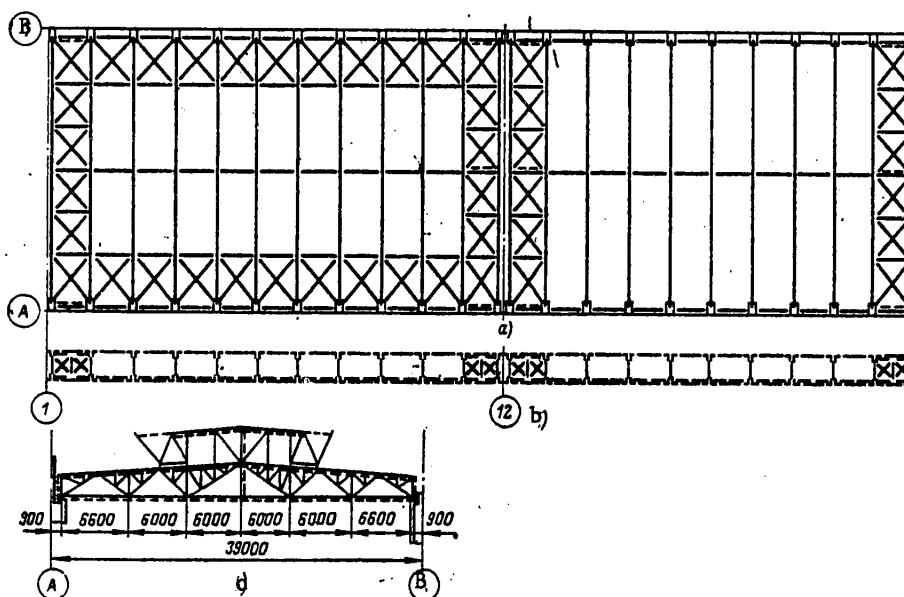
Roof of the machine room. a--plan with respect to the lower webs of the trusses. b--longitudinal section. c--transverse sector
